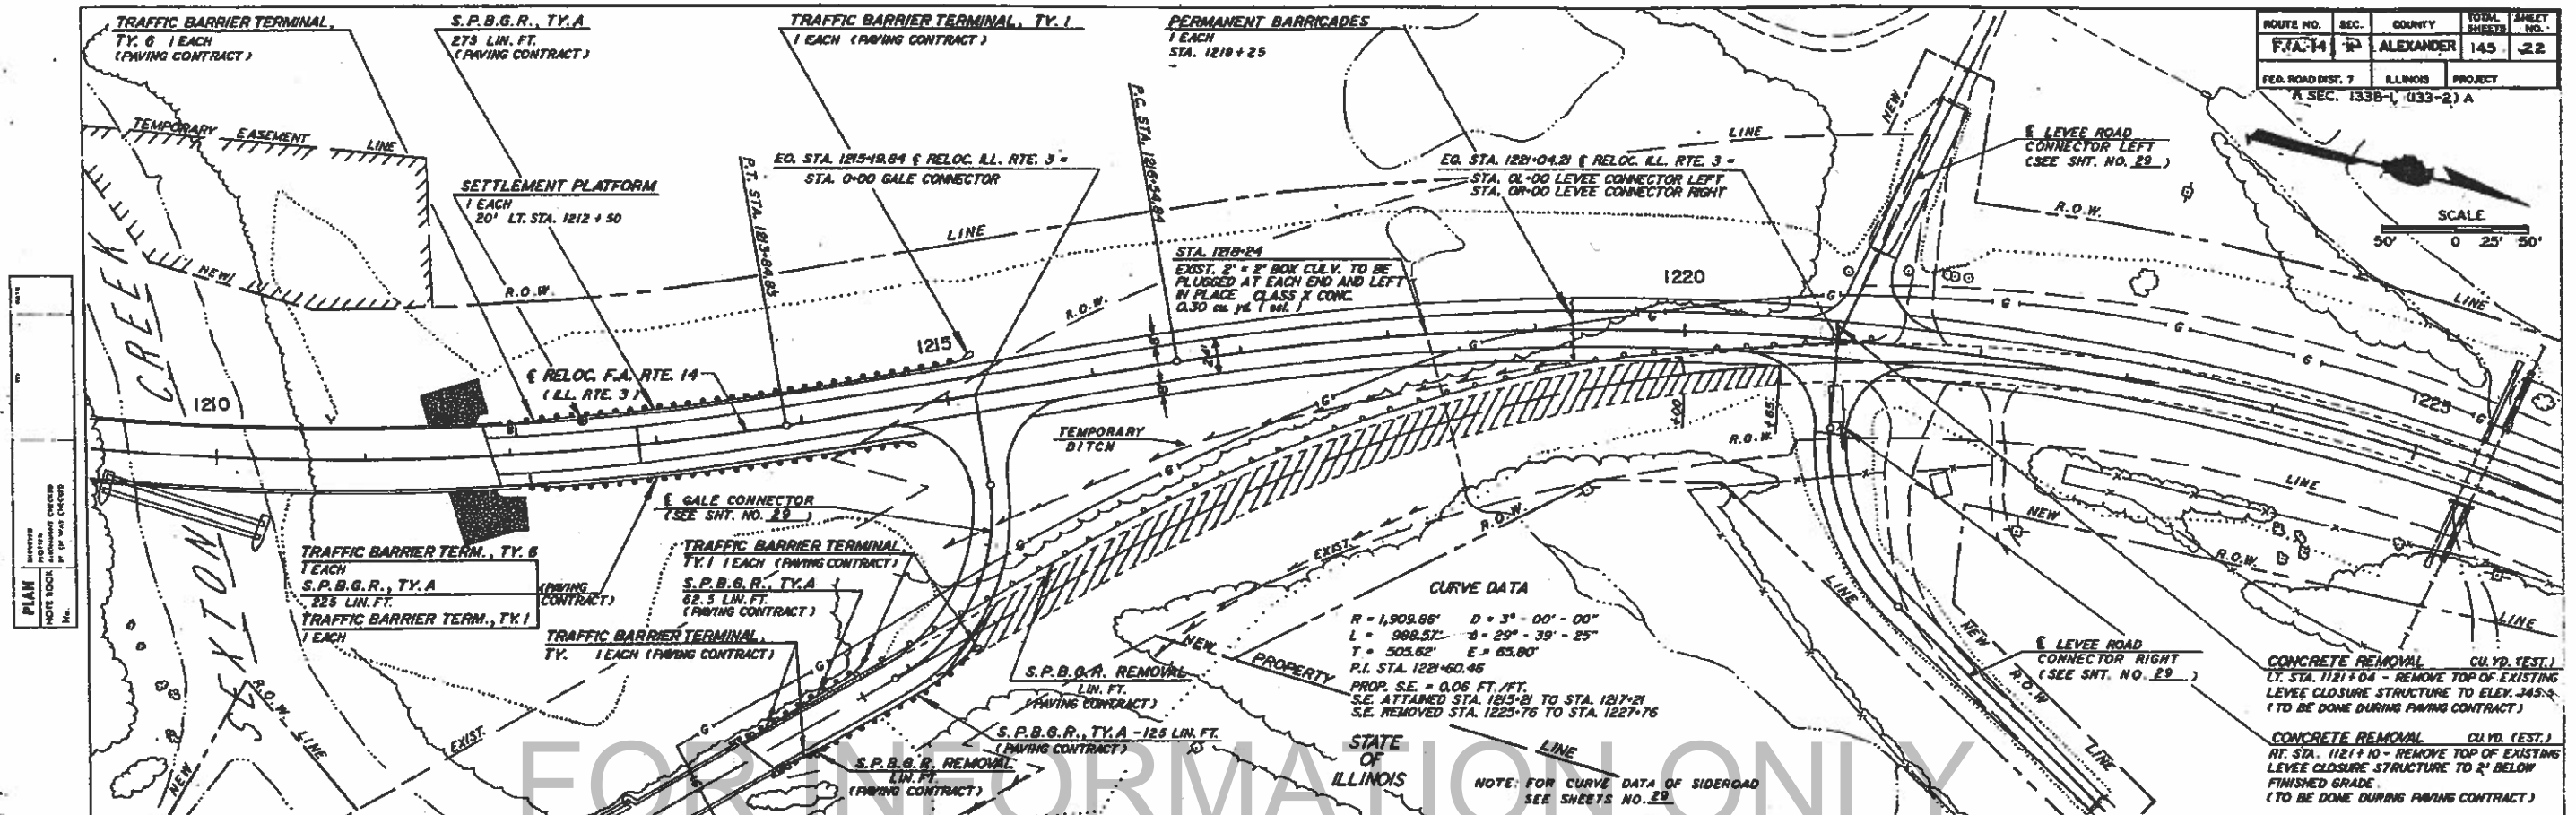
SINGLE PLAN AND PROFILE-PALL LINE
